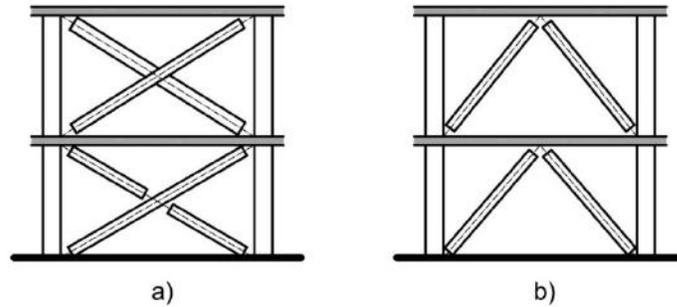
Different steel bracing configurations considered for the retrofit scheme RS2: a) X-shaped braces, and b) Chevron (inverted V) braces.
